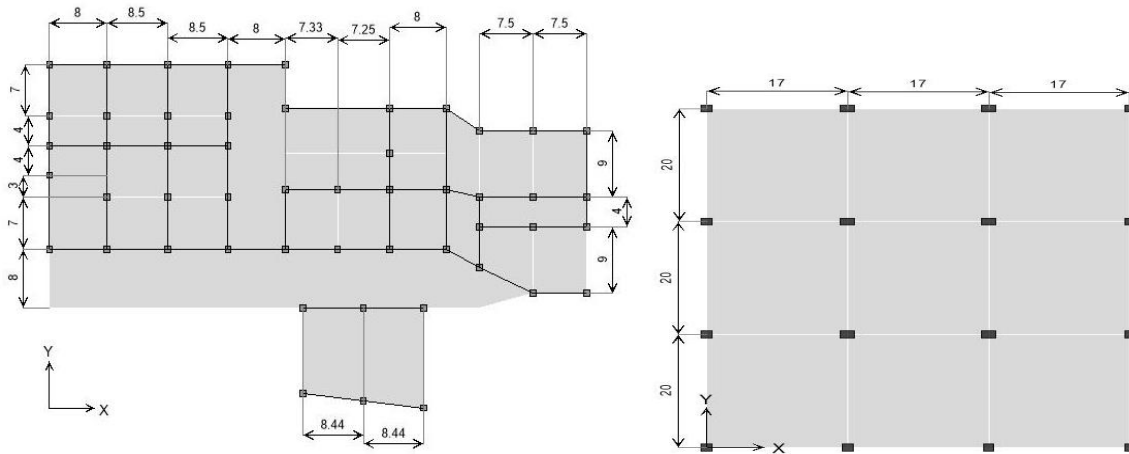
Floor plan of C1M type building Figure 3: Floor plan for C1L type building
